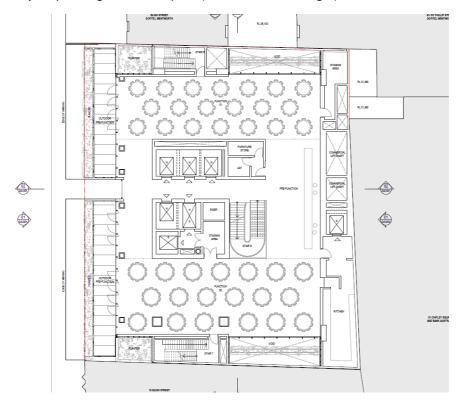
| Proposed level 1 (Source: Woods Bagot)
